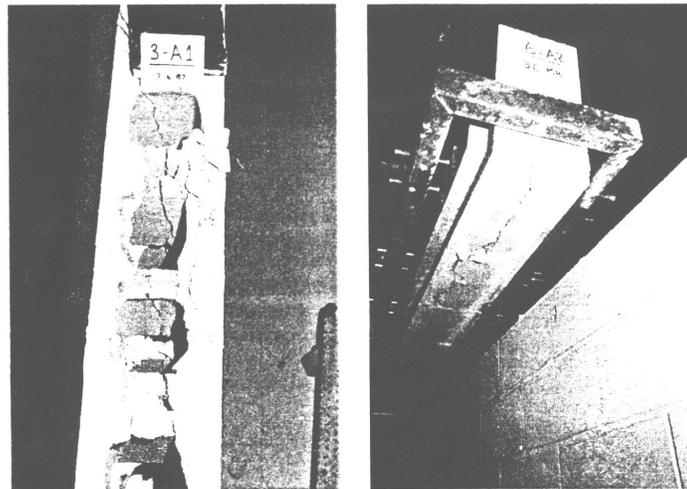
Failure modes of bond-beamed hollow concrete masonry walls subjected to concentrated load
